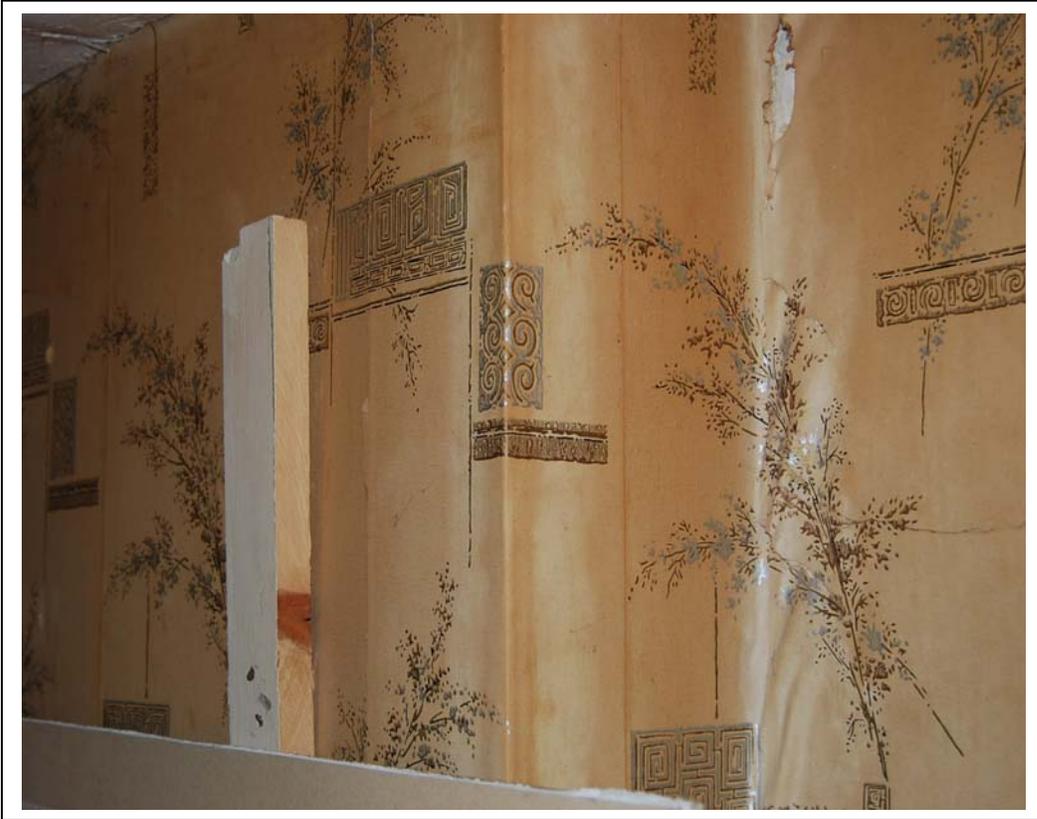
Wallpaper hung circa 1960 in the center hall, downstairs toilet room, and hall bathroom. This photograph shows the north end of the upper east wall of the lower hall, where the wallpaper was concealed above a drop ceiling installed in 1977. Joan Olmstead's daughter, Robin, remembers that her grandparents hung this wallpaper "sometime in the 1960s." Photograph by Anne Derosie, September 2007.
